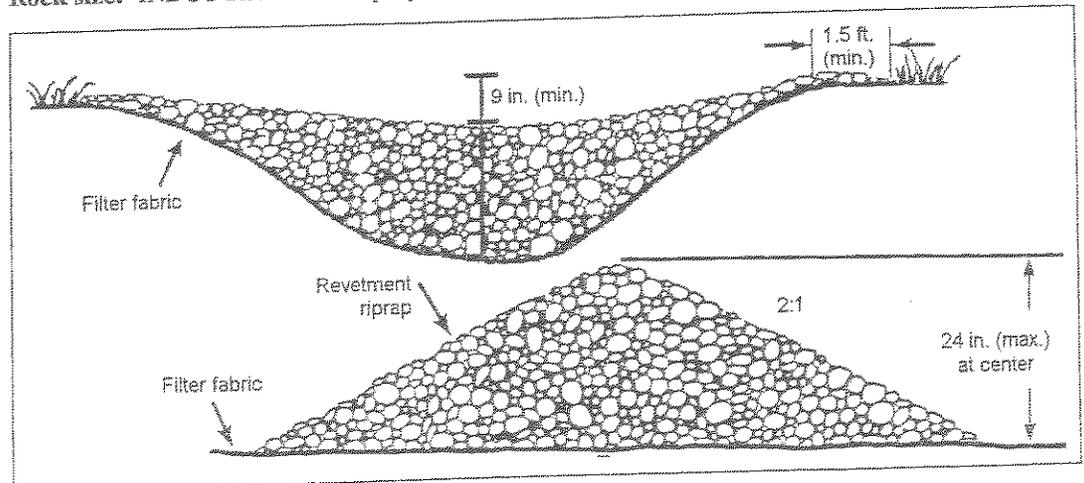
B. Forward and cross-section views of a rock check dam.
